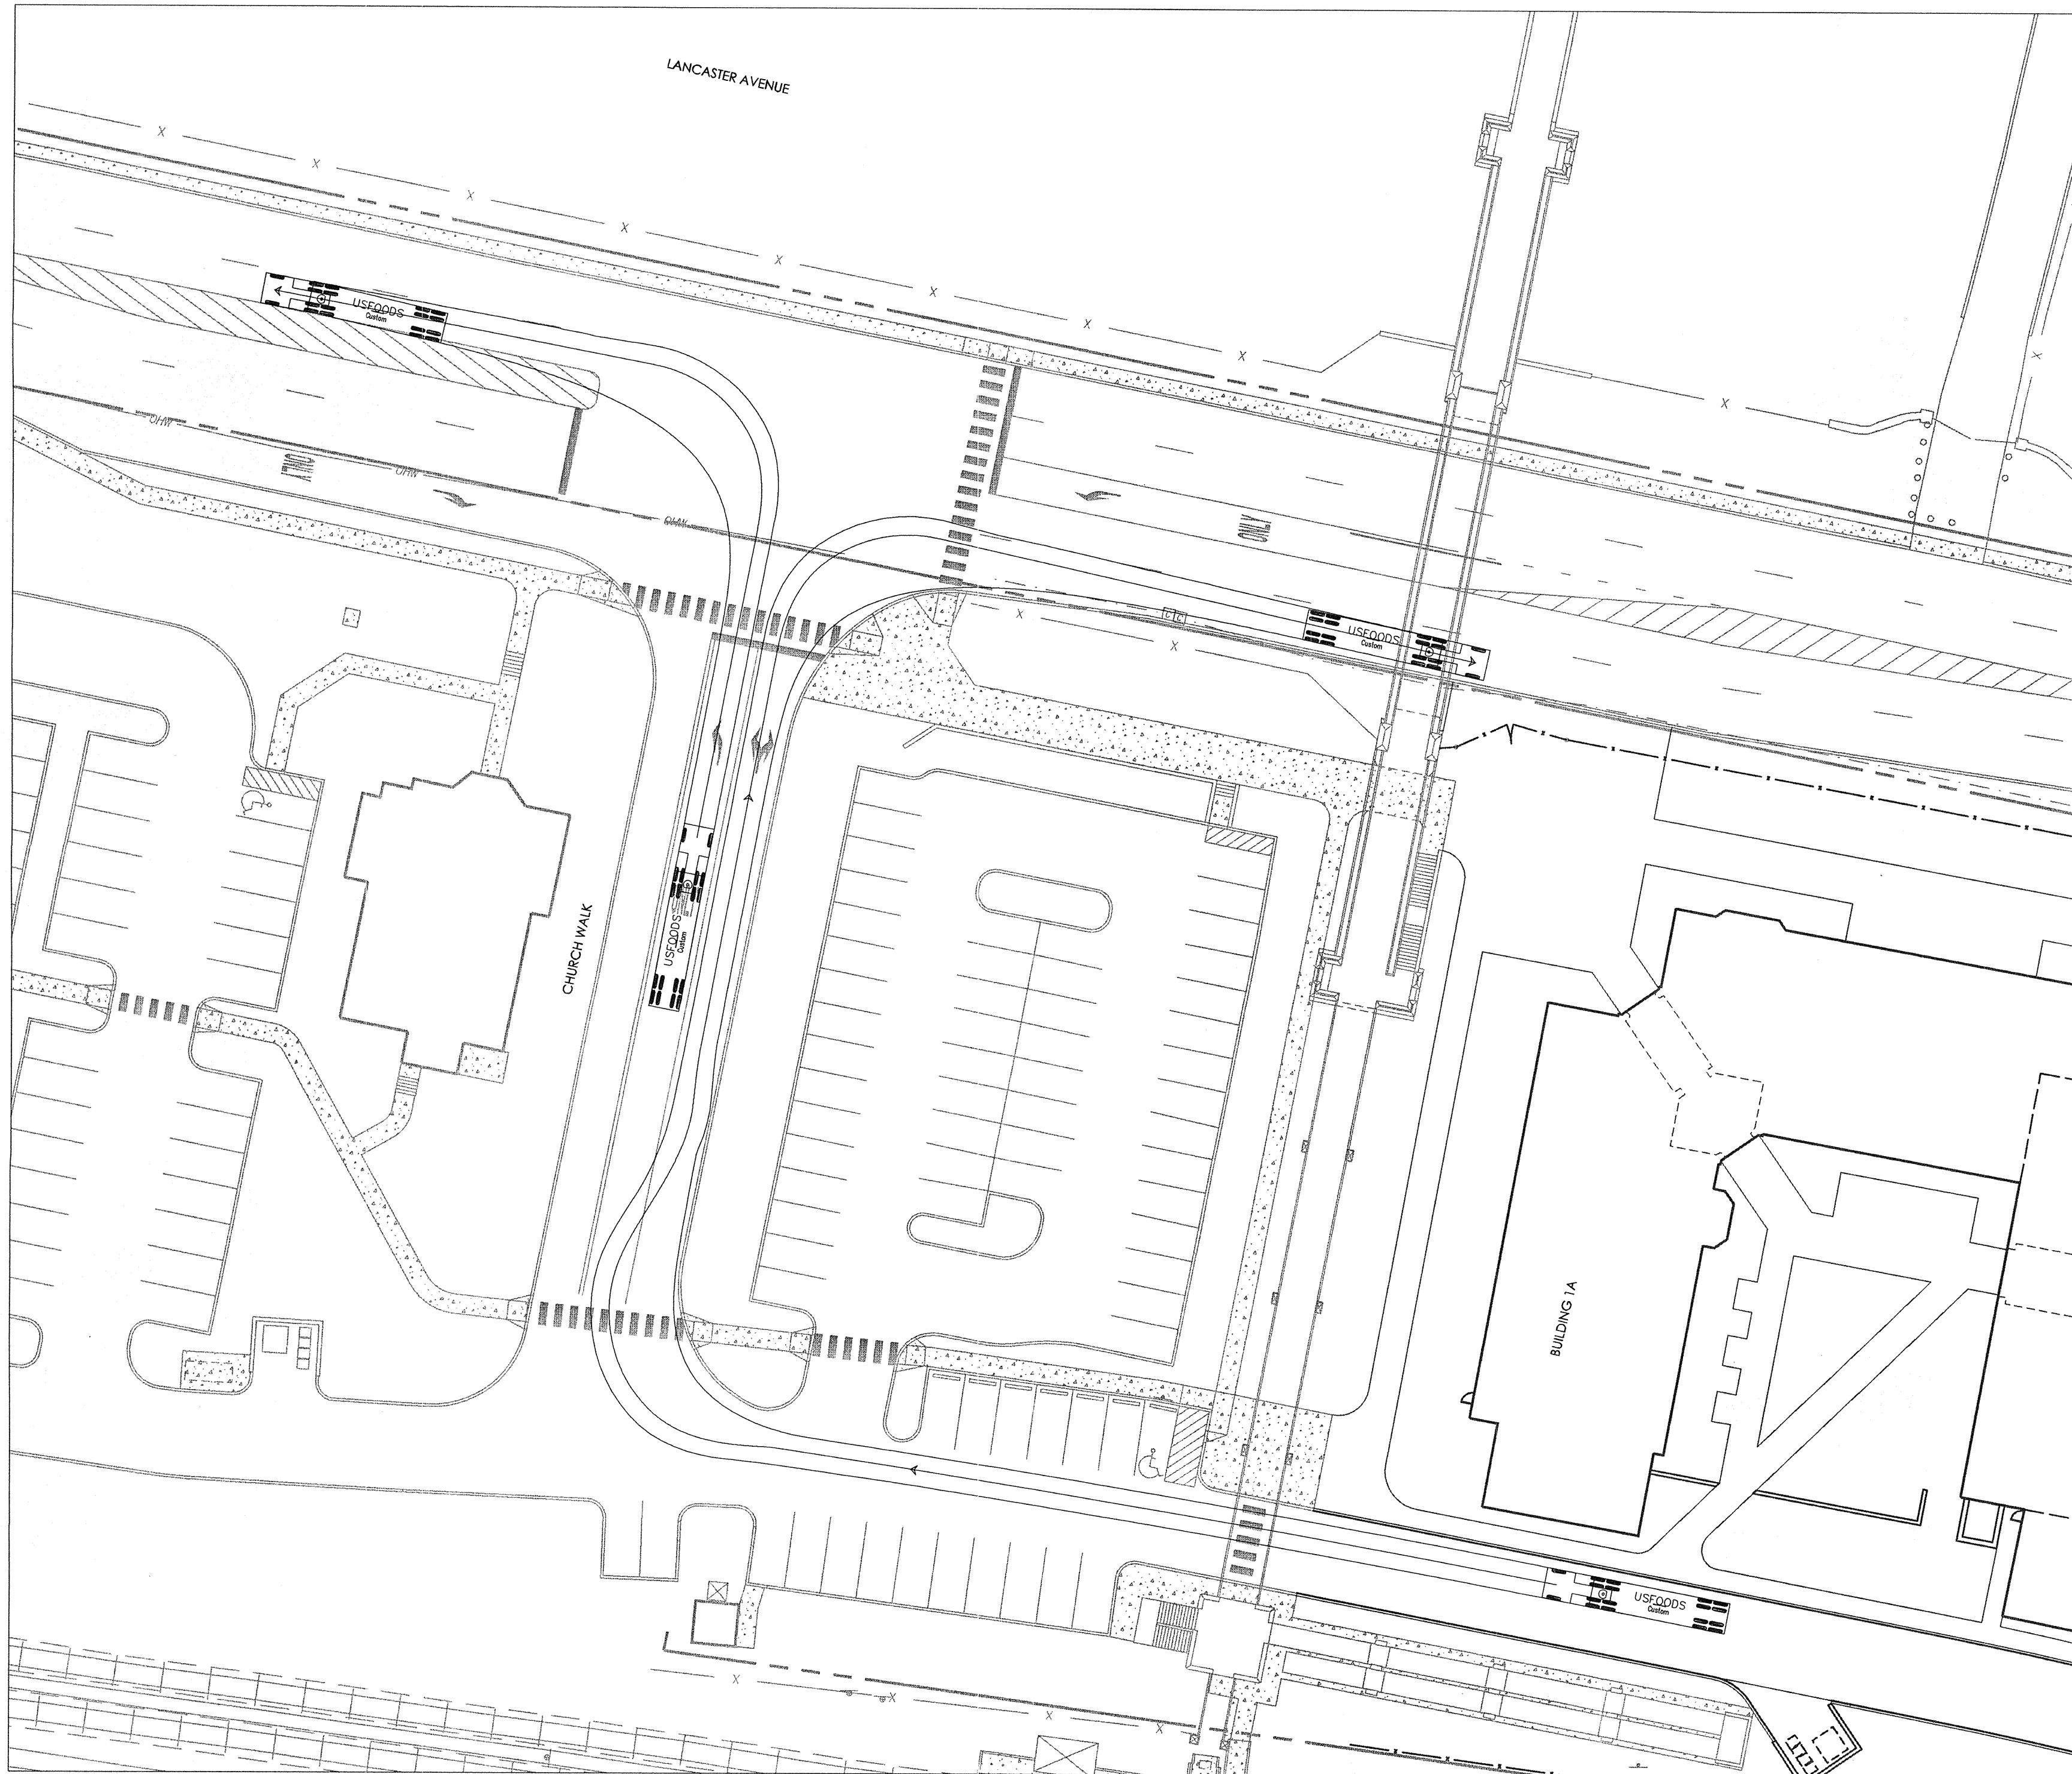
CHURCH WALK TO LANCASTER AVENUE - RIGHT AND LEFT TURN, AND SITE TO CHURCH WALK (US FOODS)
